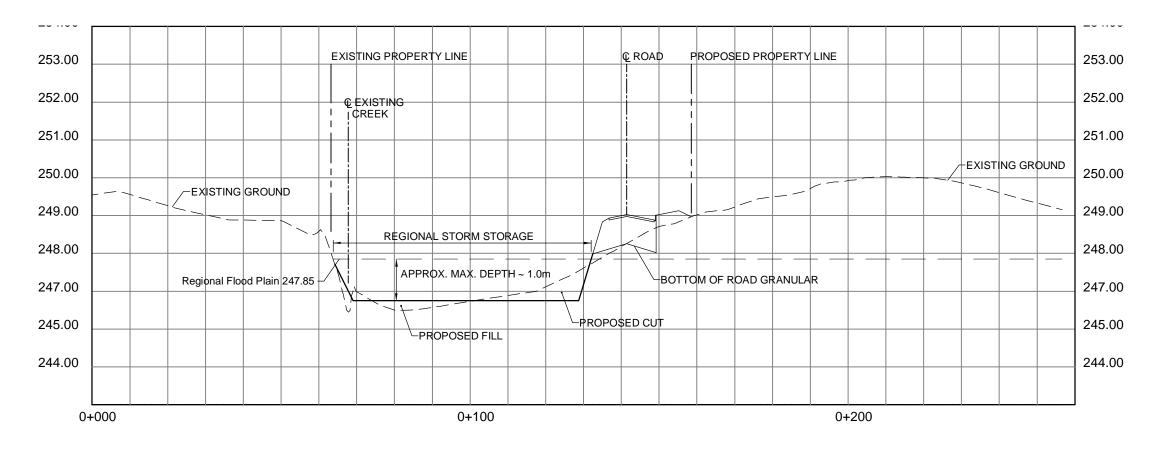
on the next page contains a cross section of the New East-West Road adjacent to the Upcountry development at Station 60+400 (looking south along the proposed alignment), which is roughly at the centre of the recommended alignment shift. It illustrates the relationship between the required roadworks and the new Regional storm storage area on the east side of the roadway. The depth of storage during the Regional storm will be approximately 1.0 m at this location. The plates at the end of this report illustrate the approximate extent of the resultant Regional storm floodline (Upcountry Plates 1 and 2).
